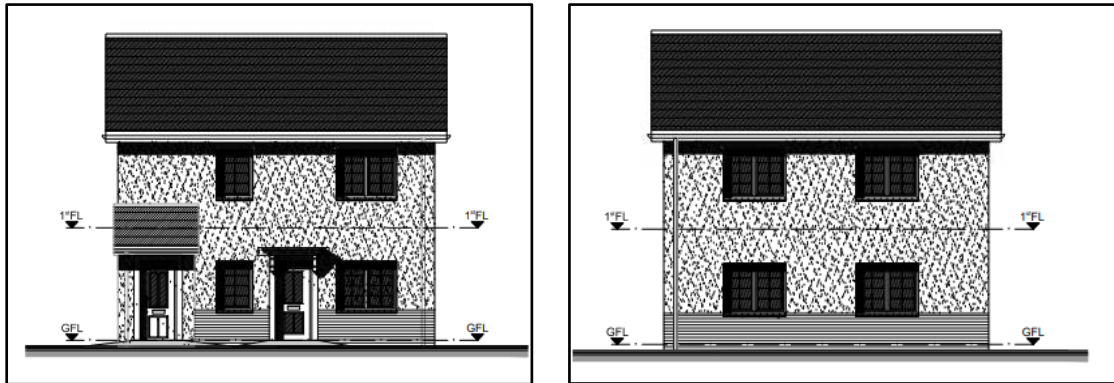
Elevations Proposed Blocks 7, 9 and 12
